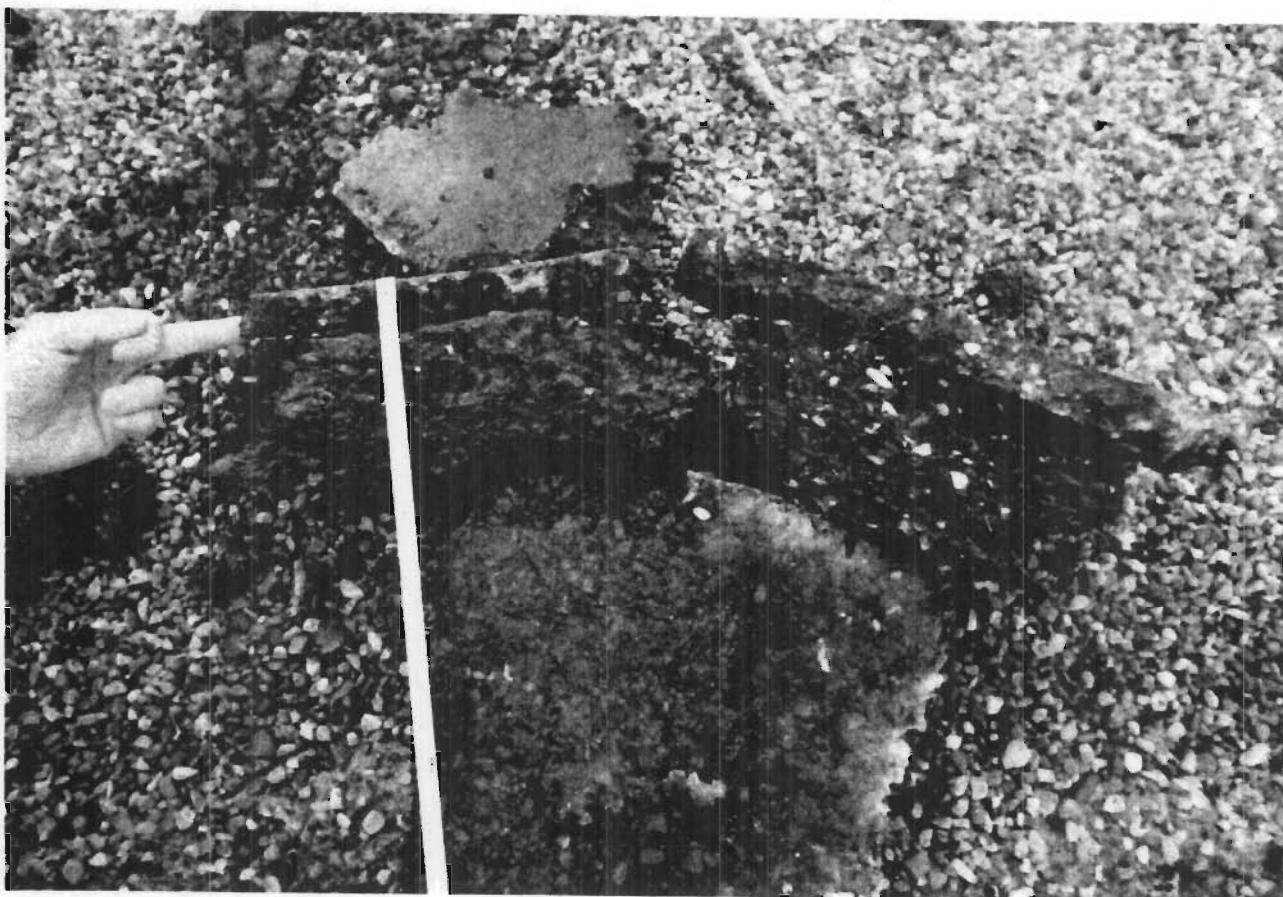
EVIDENCE OF PLANT MIX STRIPPING
